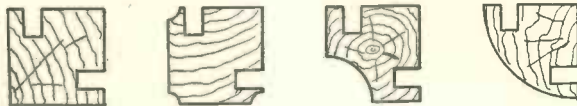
SECTIONS THROUGH TYPICAL MOULDINGS.
